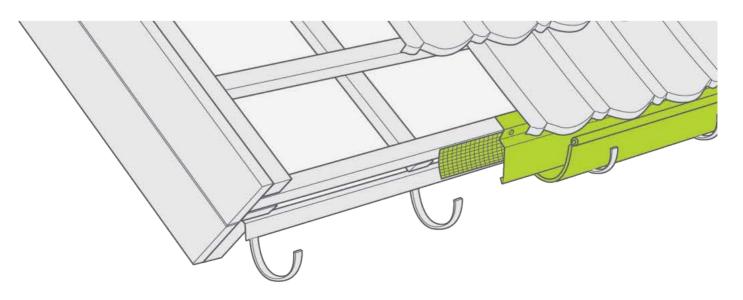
EAVES DETAIL WITH ANTICODENSATION FLASHING, BIRD PROTECTION GRID AND EAVES FLASHING
